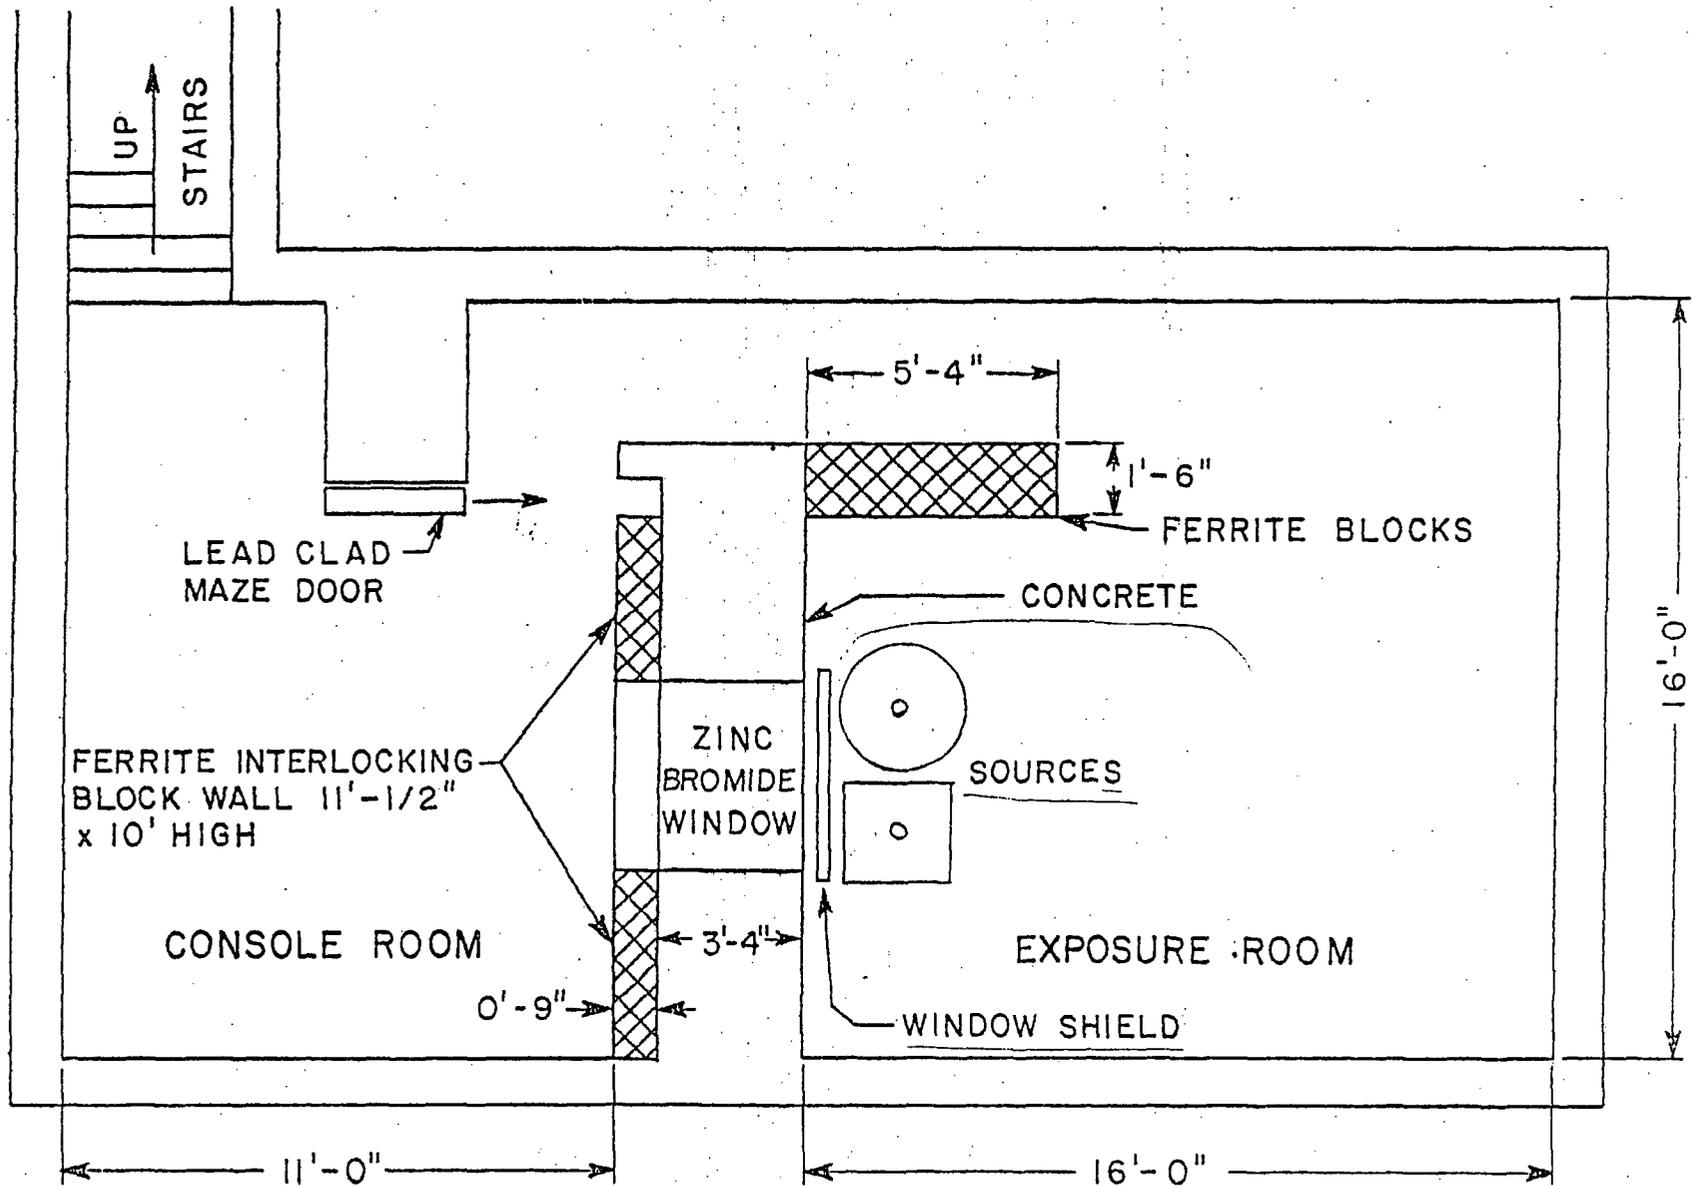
PLAN VIEW UNDERGROUND VAULT
